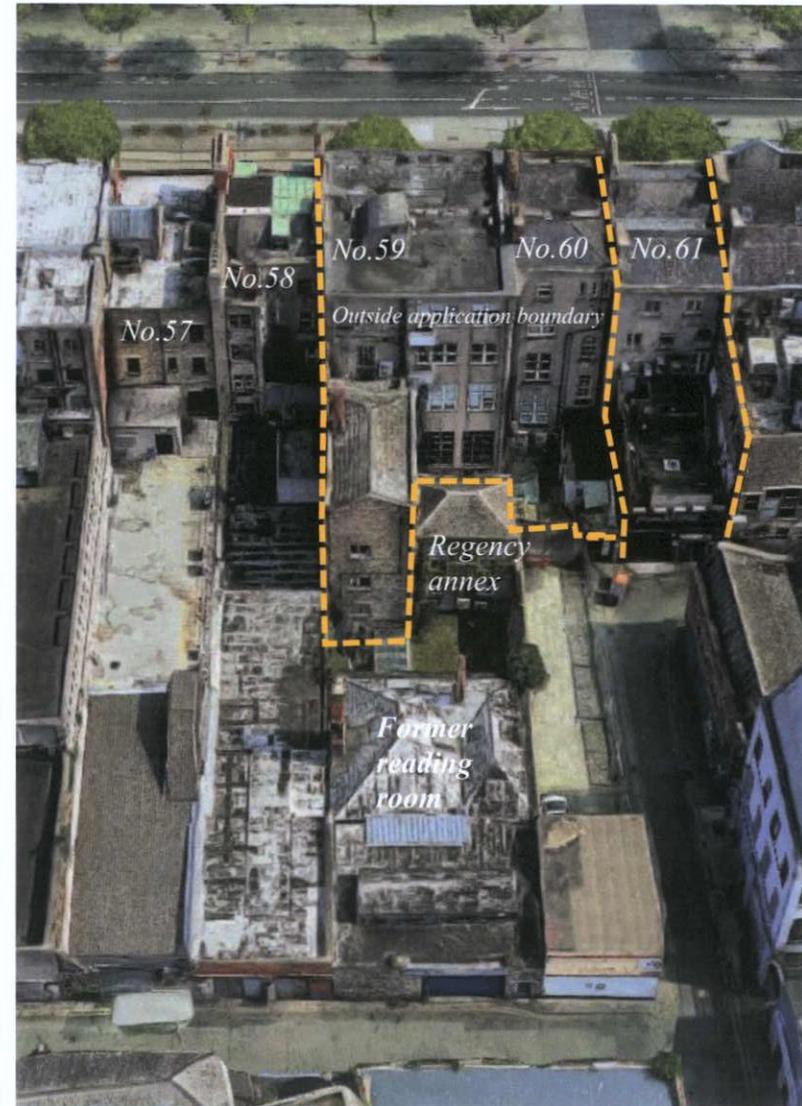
The southern end of Site 2 (including No.61 O'Connell Street Upper) shares multiple party and boundary walls with neighbouring sites. Indicative position of applicant boundary identified with an orange dashed line for illustrative purposes only.
